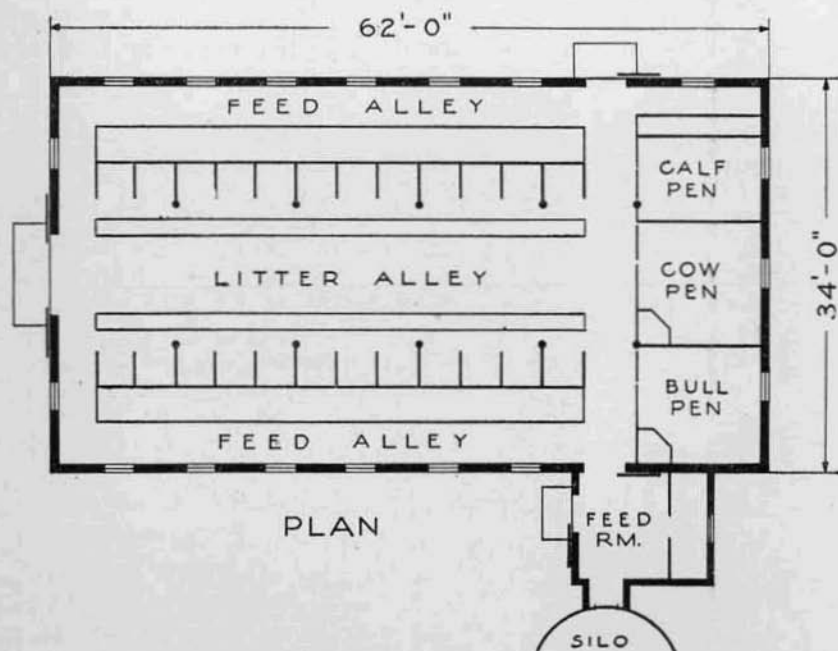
Floor plan of a typical average-size dairy barn. The lay-out is designed so that ultimately standard commercial metal equipment may be installed. (Plan .723-30 or U.S.D.A. 3220) For further details refer to U. S. Department of Agriculture Leaflet No. 232, *A Wartime Dairy Barn*.
